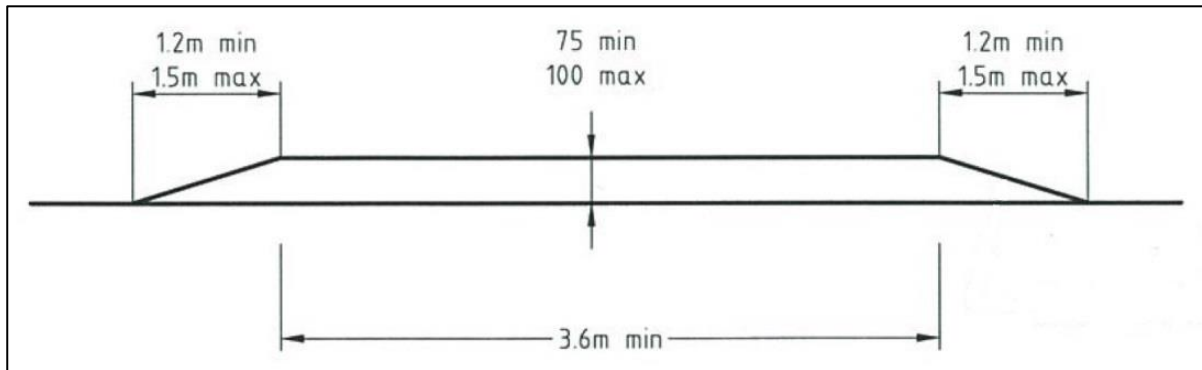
Raised Plateau Speed Hump – Longitudinal Cross Section
